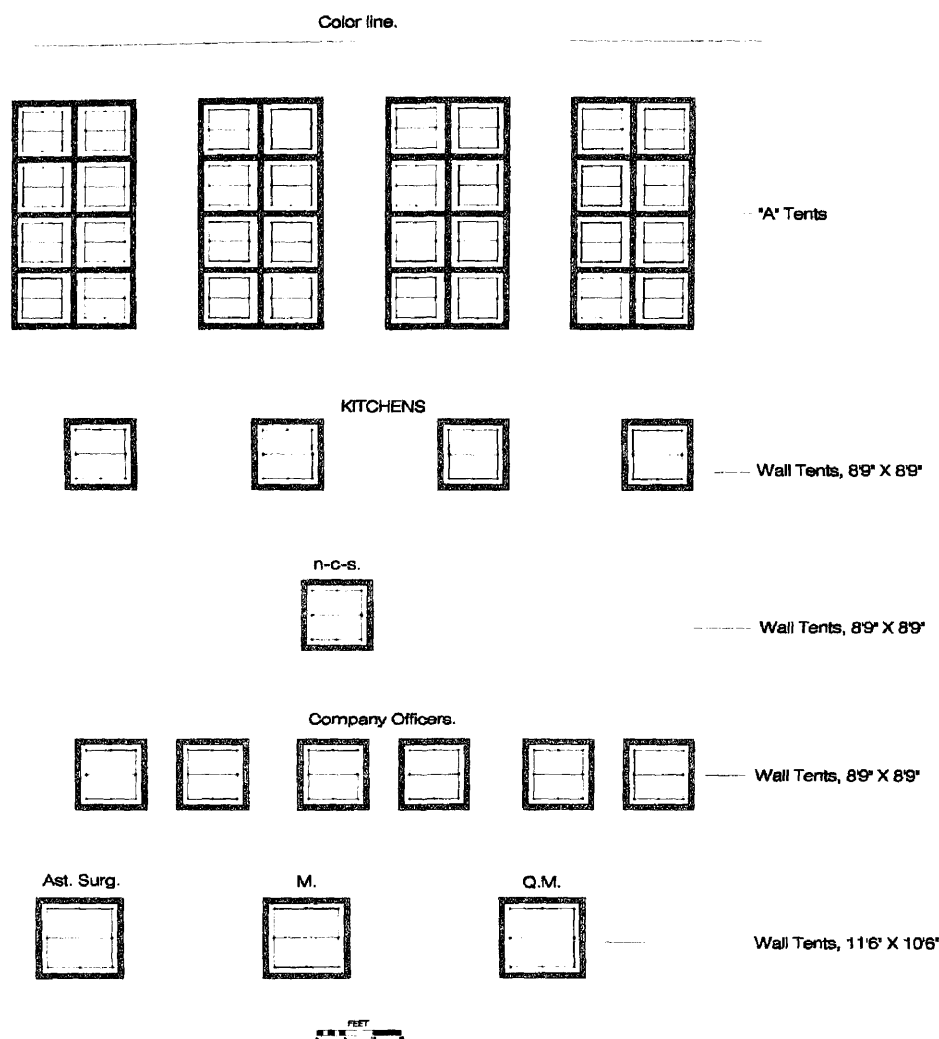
Diagram illustrating potential arrangement of drainage trenches around tents on a regulation layout camp. Refer to figure 7 to see corresponding camp layout.
